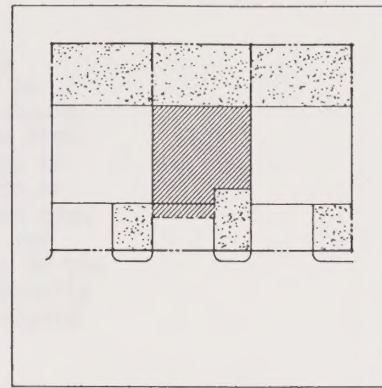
B.2-7. Second-floor living space over garage and over first-floor dwelling front.
